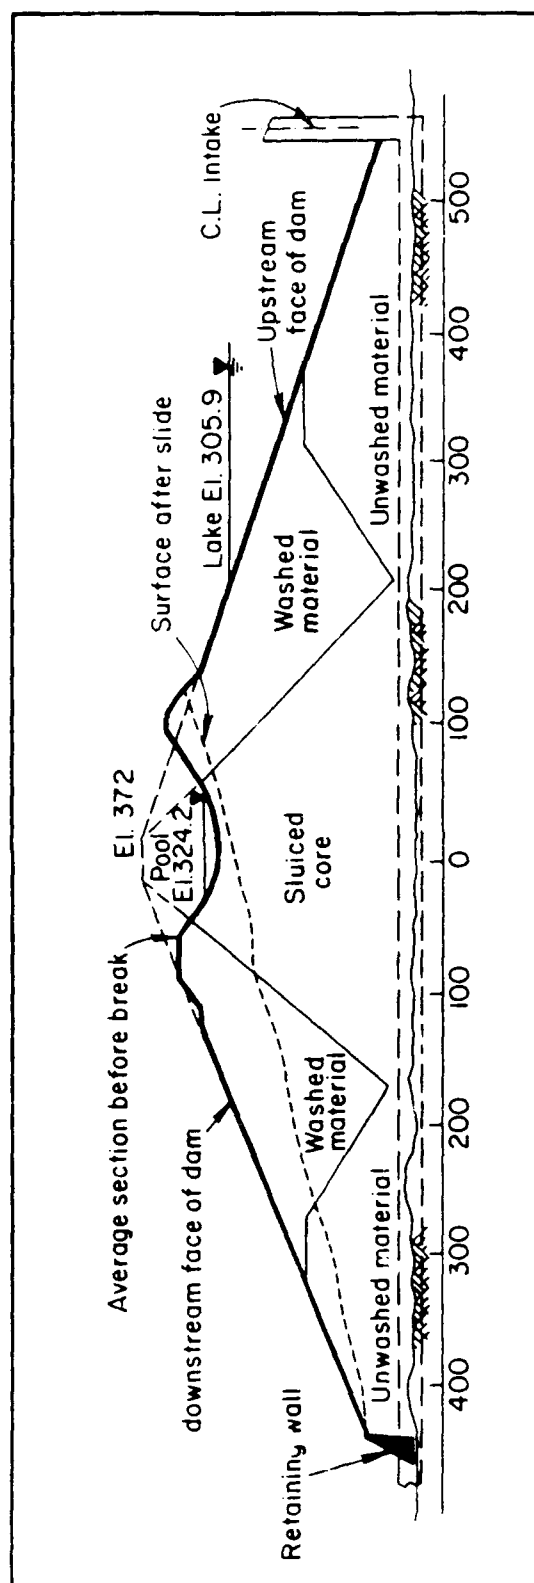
Cross Section of Saluda Dam (after Engineering News Record, 1930a)
